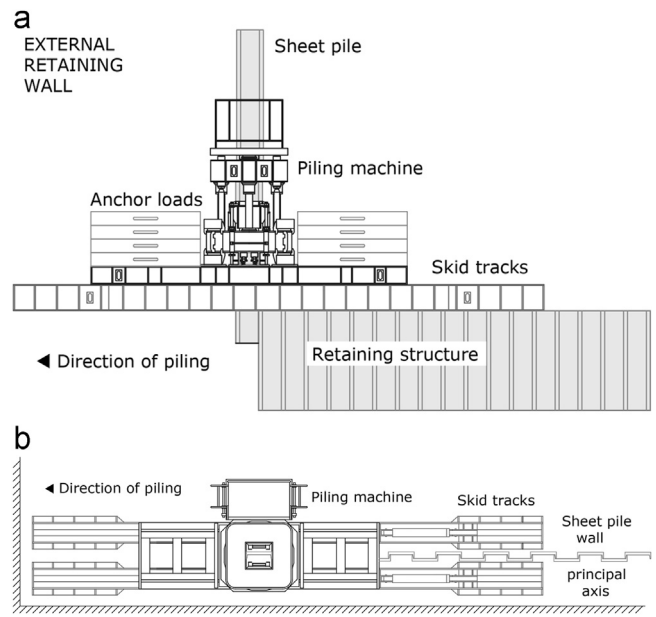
Installation of sheet pile elements (retaining structure) with a flow-line method. (a) Front view. (b) Plan view.
